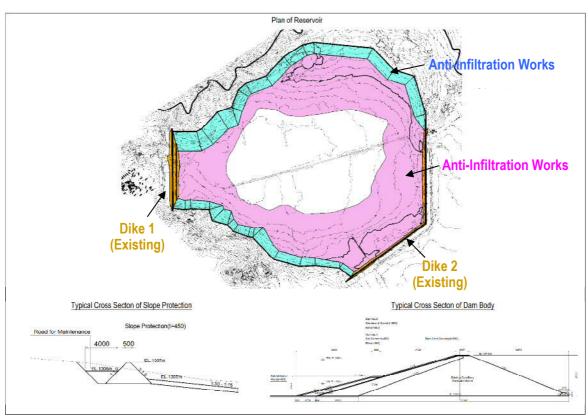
Plan and Typical Cross Section of the Reservoir
